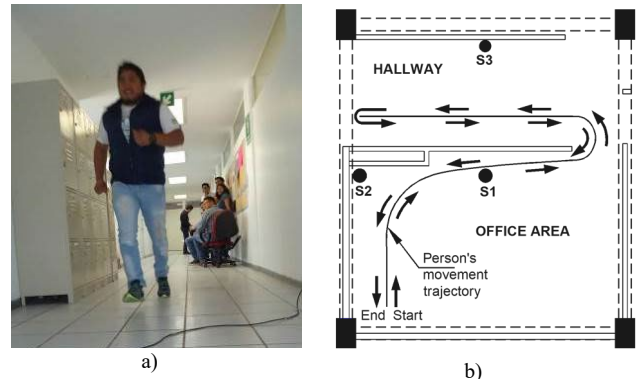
Walking test performed on the two-way reinforced concrete slab panel in an office building: a) one person walking and b) walking trajectory.
